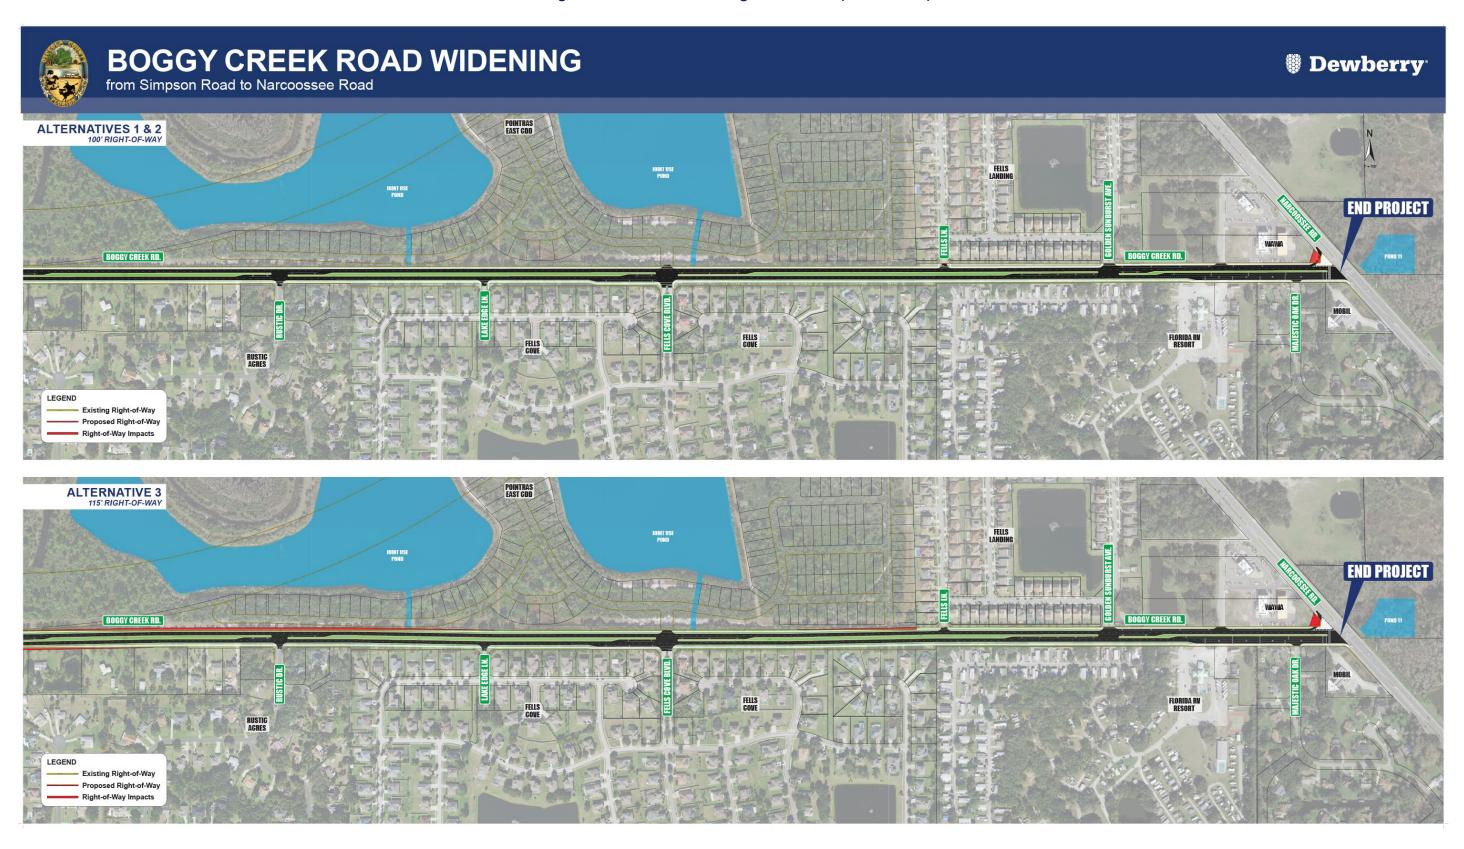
Alternative Alignments Plan (Sheet 4 of 4)
